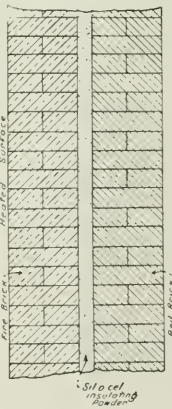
TYPICAL WALL CONSTRUCTION WITH SILOCEL POWDER IN HOLLOW WALL
